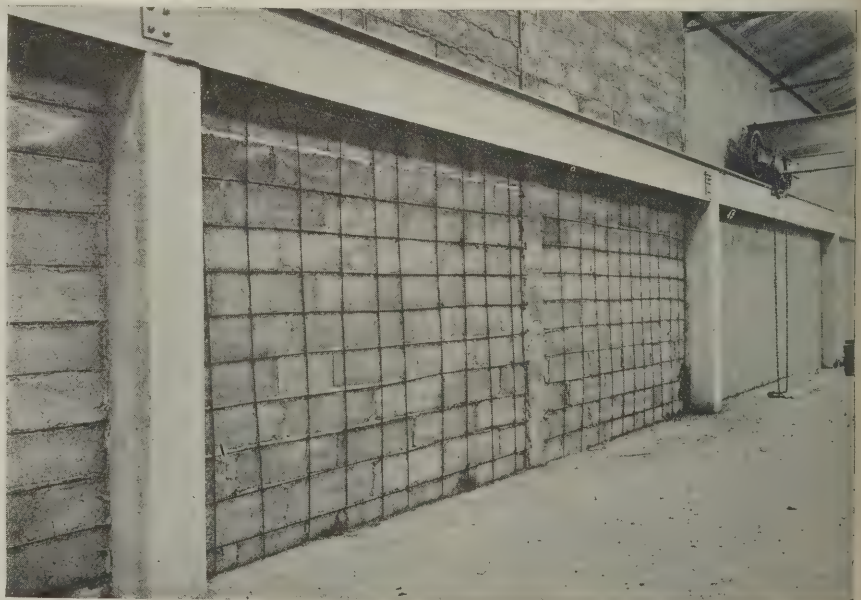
CONCRETE SLAB WALLS IN COURSE OF CONSTRUCTION.
